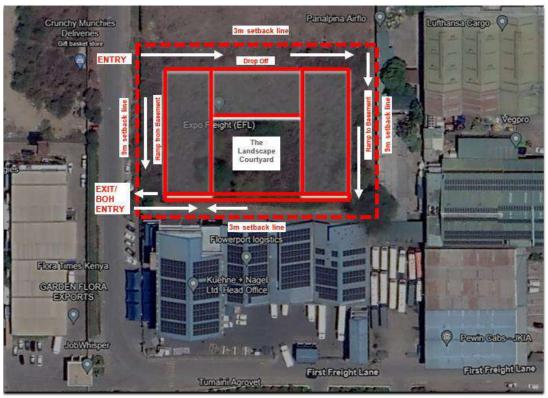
Proposed entry, exit points and traffic flow of the proposed development.
